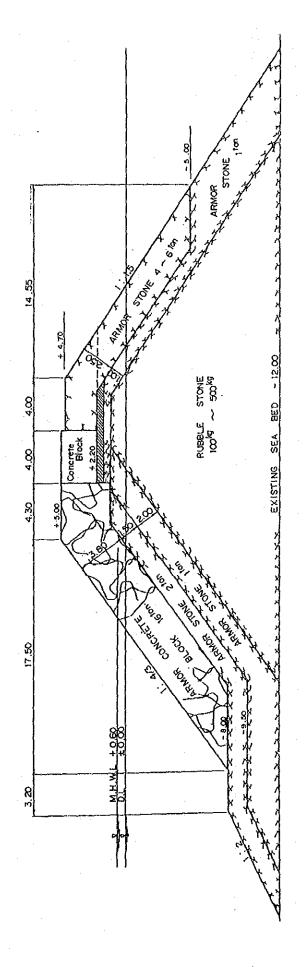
Typical Cross Section of Southwest Breakwater
